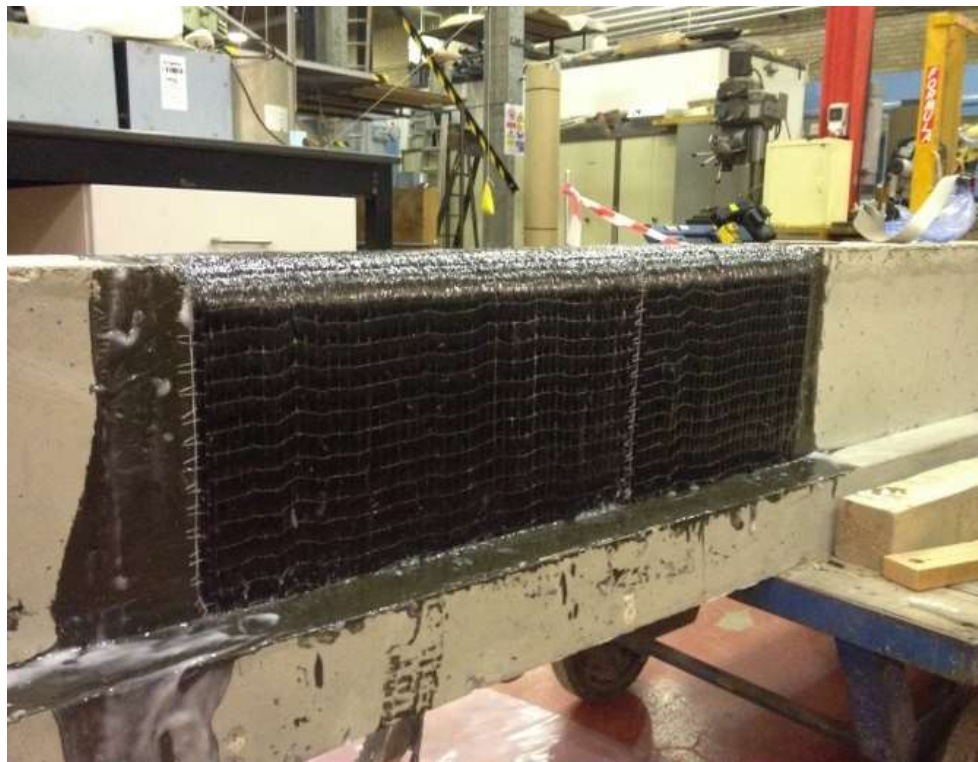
Application of epoxy-primed CFRP sheets onto a test span
